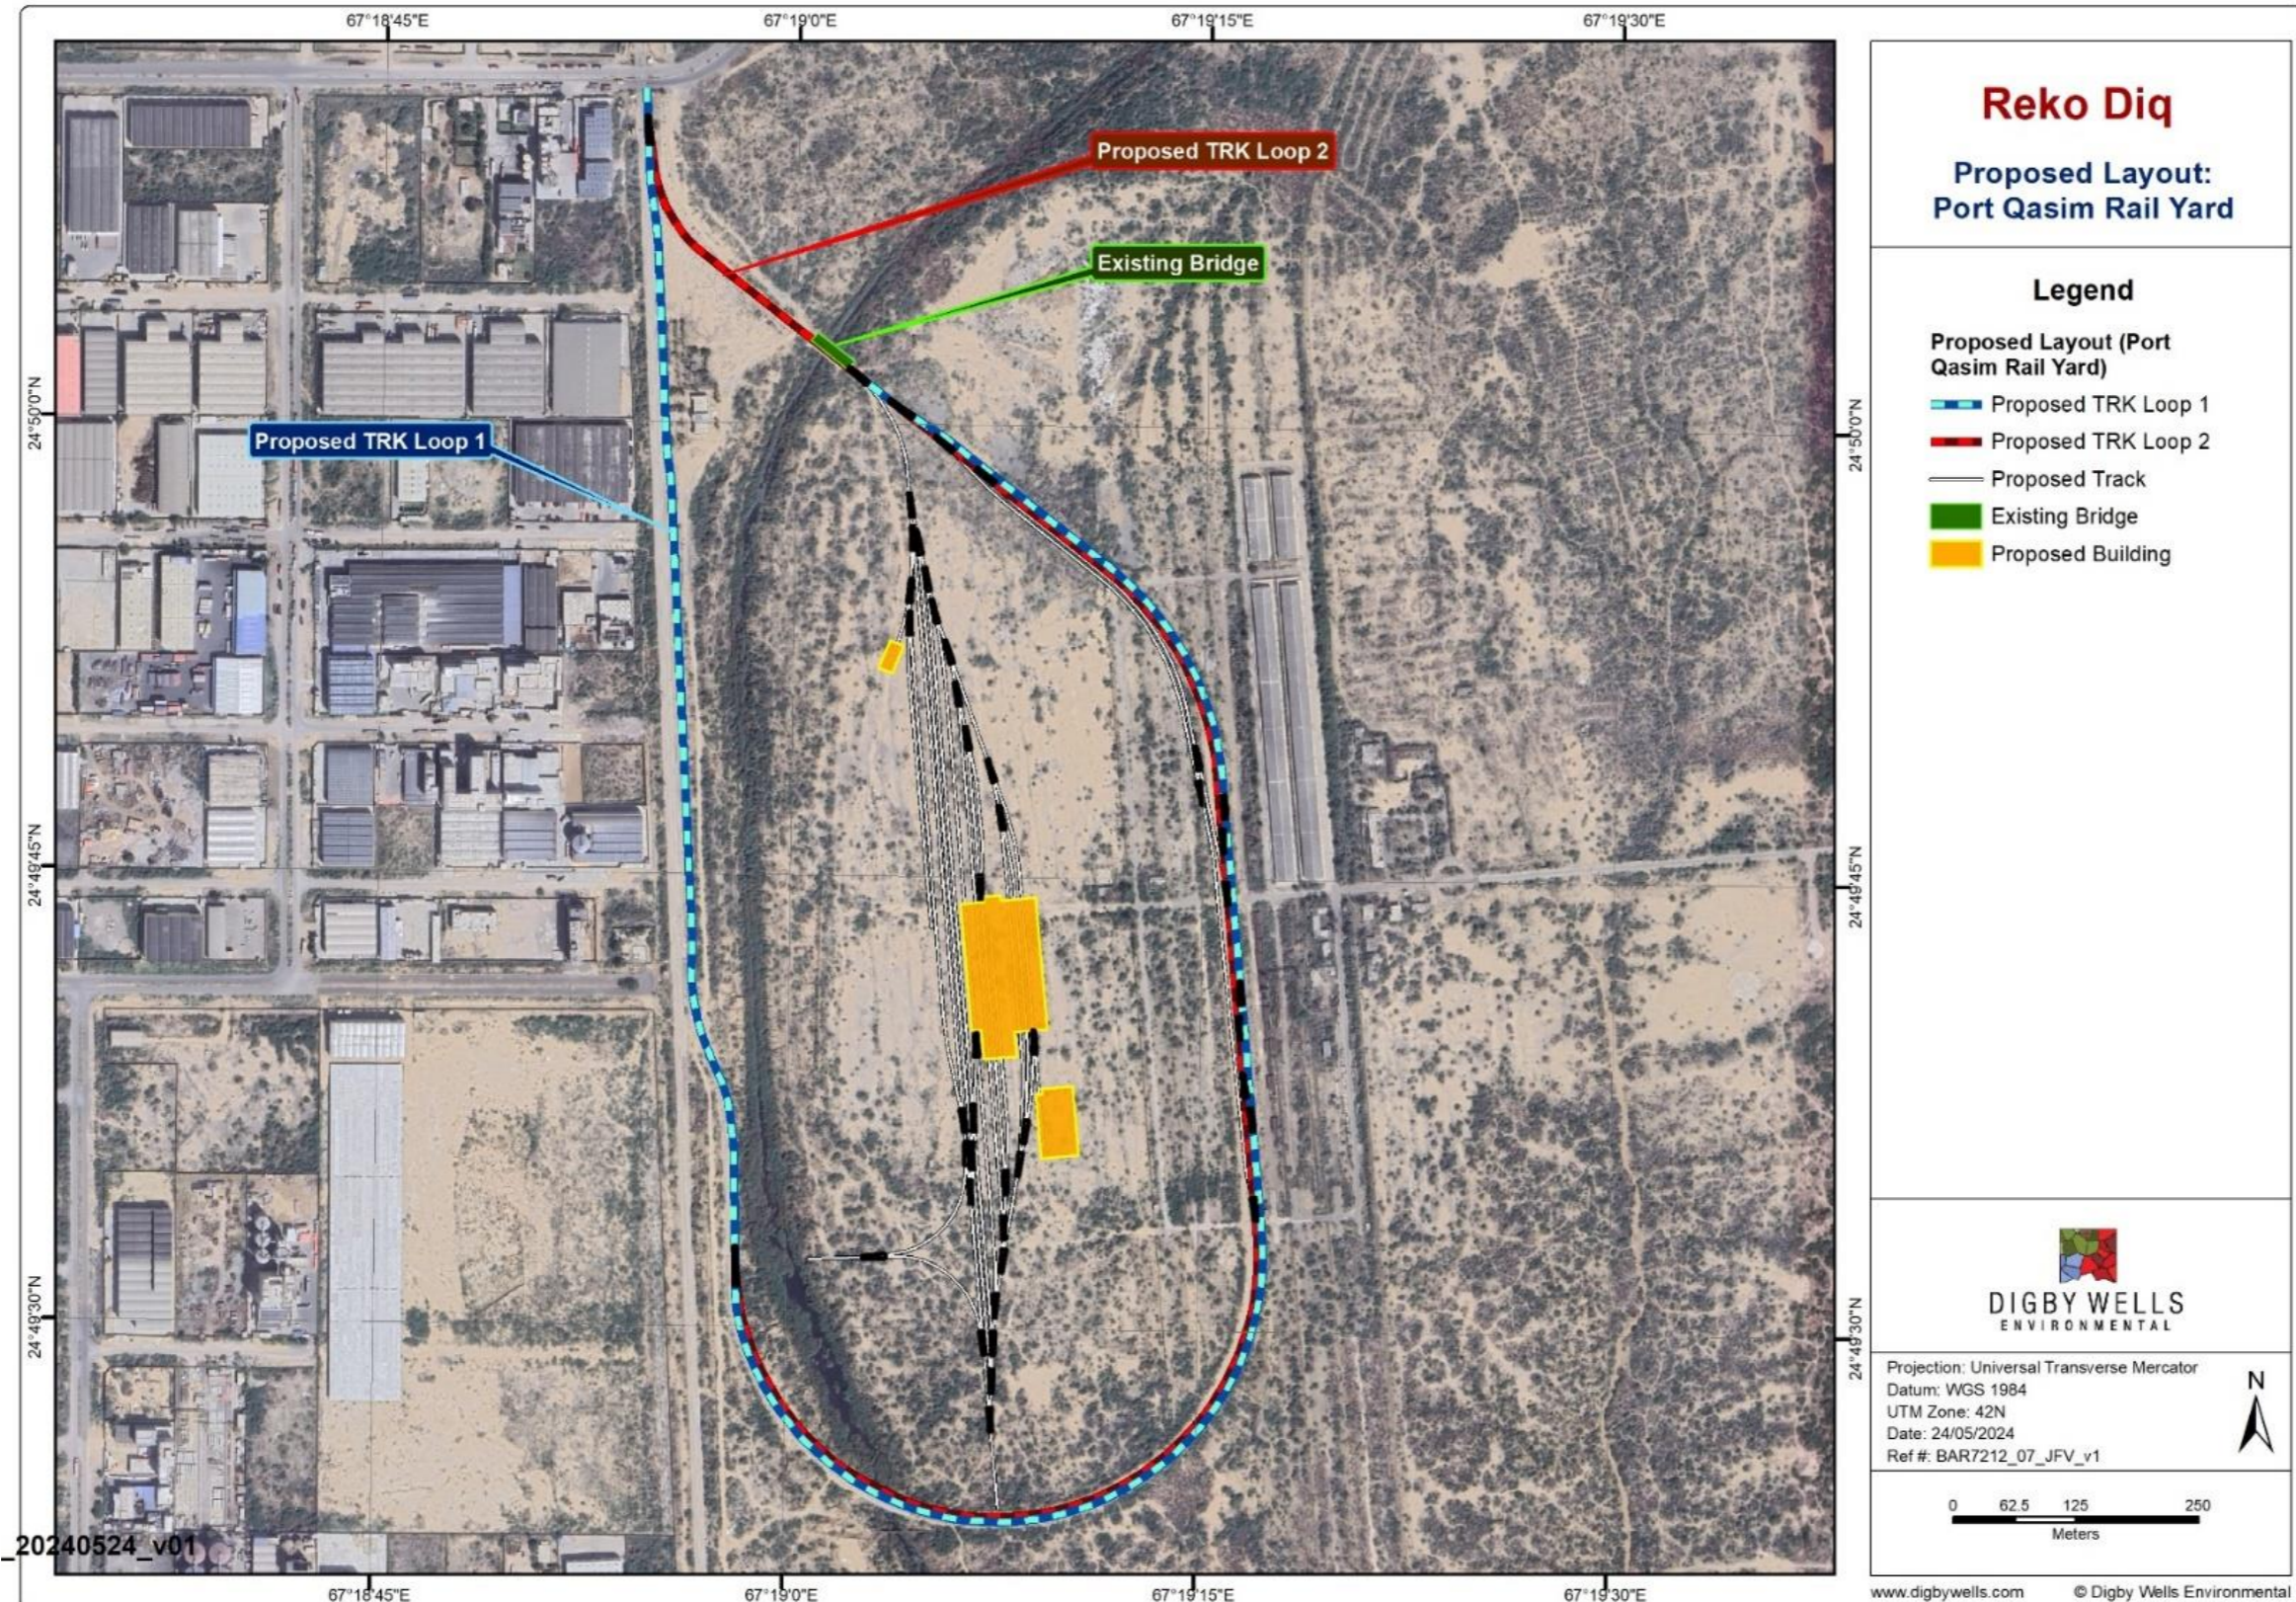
Proposed Rail Yard Layout at Port Qasim
